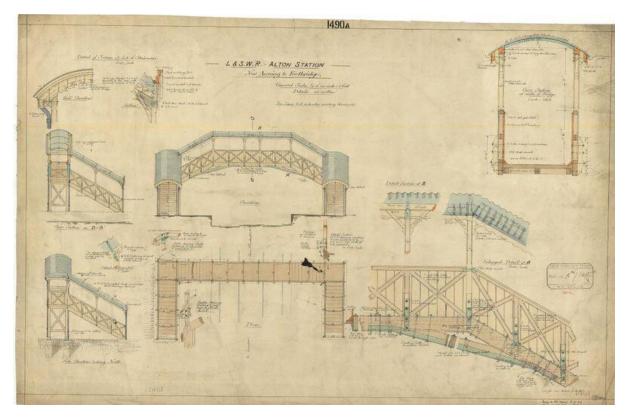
LSWR drawing of planned cladding and roof at Alton.
